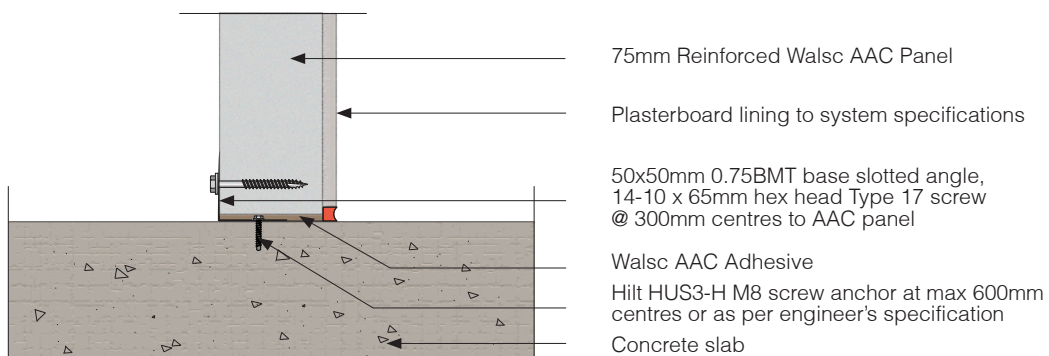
Service Shaft Wall Option 1 Bottom Fixing Detail
